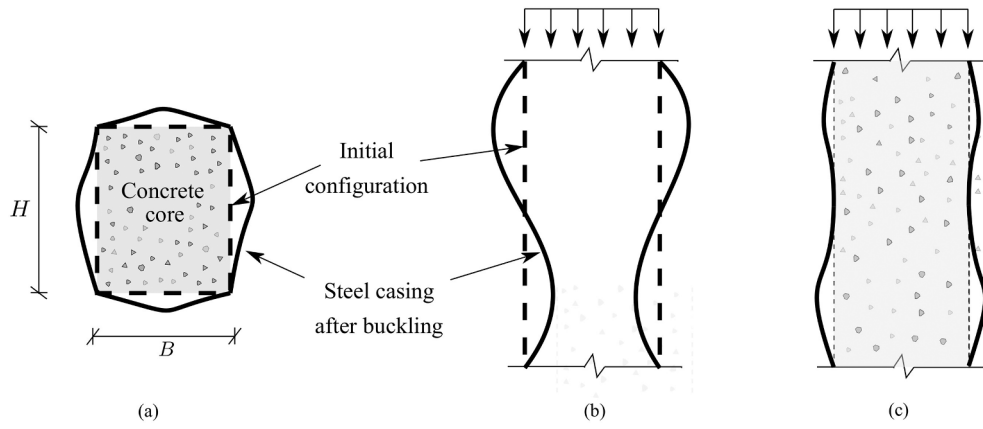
Buckling mode shapes of a) concrete-filled cross-section, b) steel casing without concrete infill, c) concrete-filled steel tube.
